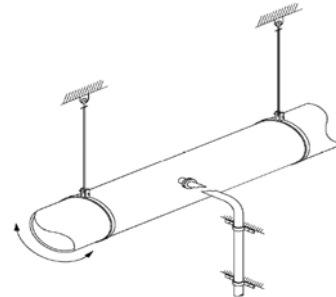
Suspended Header and Stiff Branch (ALA 2002)
